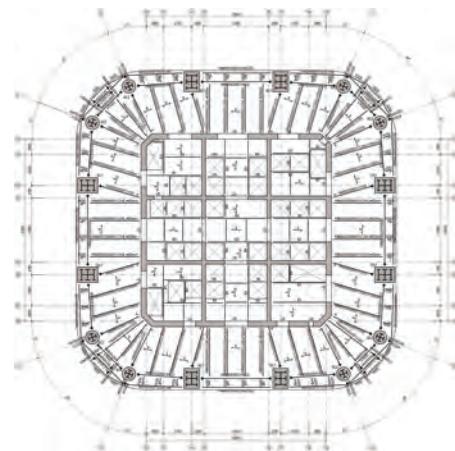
Typical Tower Structural Plan (Source: Thornton Tomasetti)
